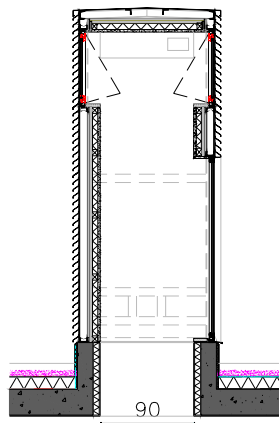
Passive stack and outlet windows for natural night ventilation
